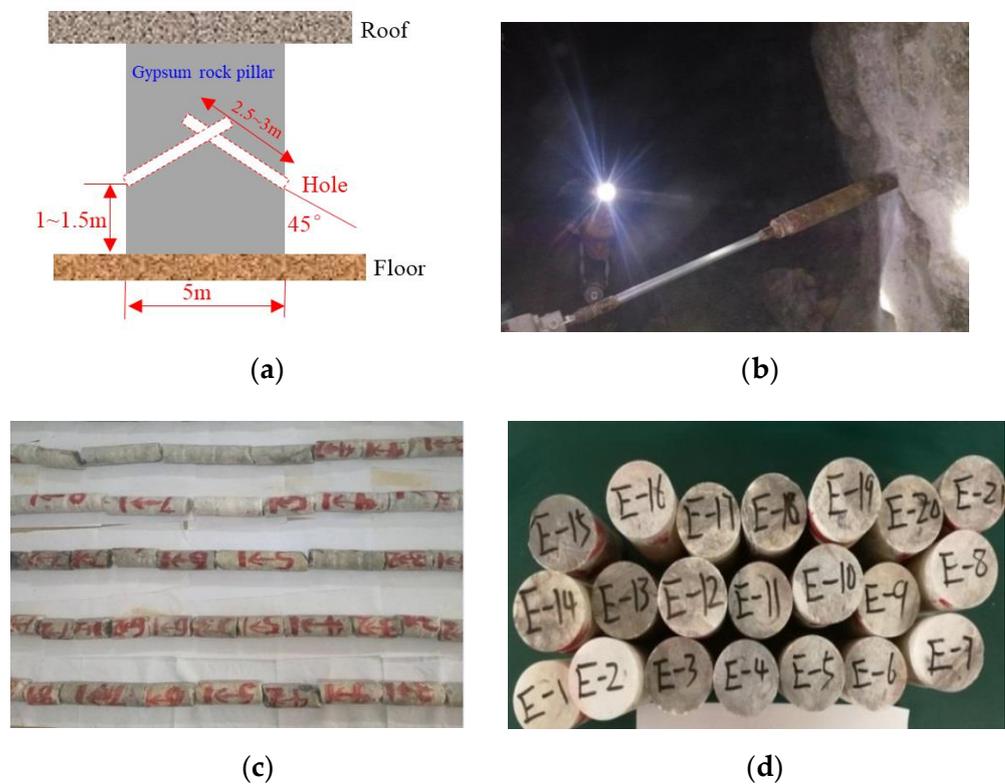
Coring method and gypsum rock specimen. (a) Coring parameter, (b) scene picture, (c) gypsum rock cores, and (d) standard gypsum rock specimen.
